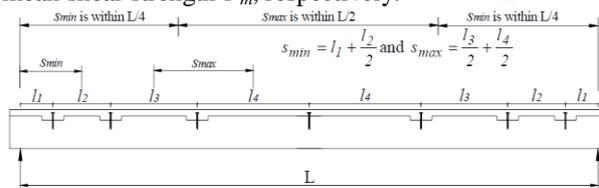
Typical TCC beam showing indicative spacing of notched connection for the definition of s_{min} and s_{max} [8]
